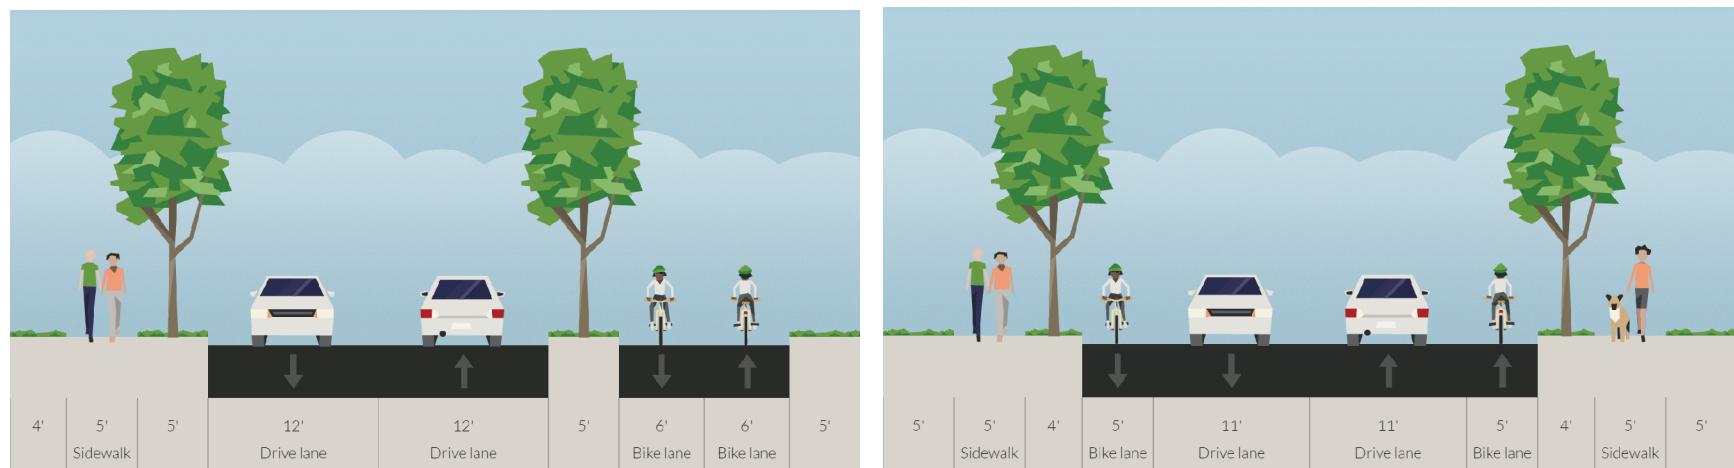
Recommended cross-section of East St with a shared use path (L) and conventional bike lane alternative (R)
